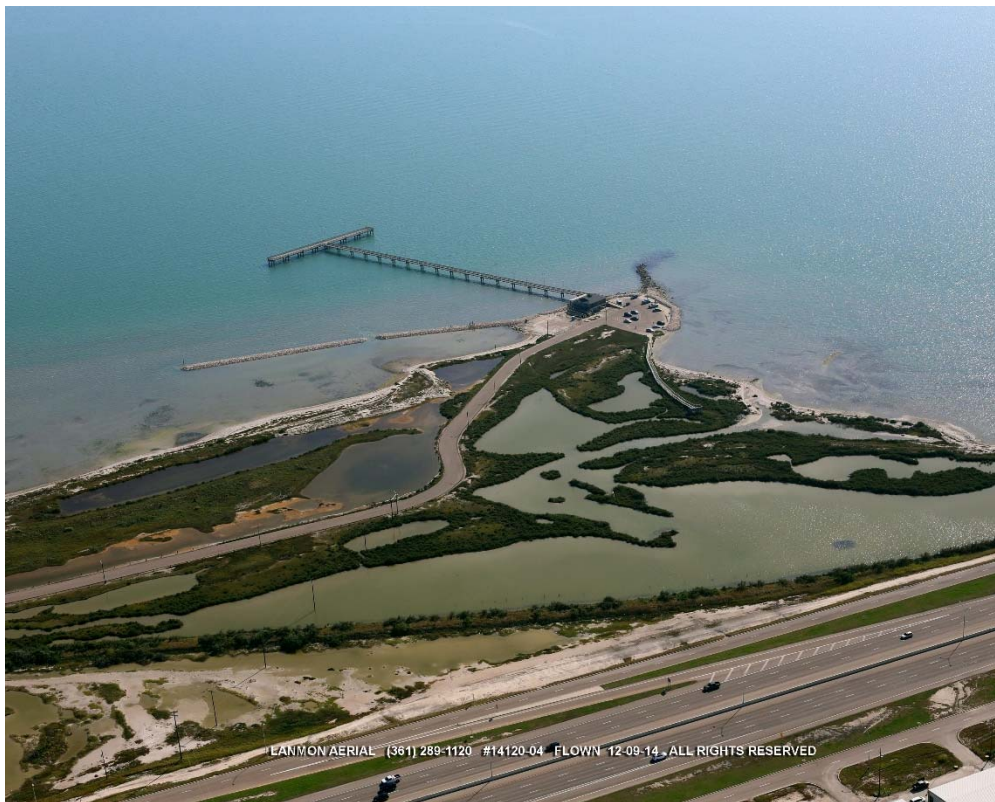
Post-Construction Conditions (Photo Provided by GLO)
